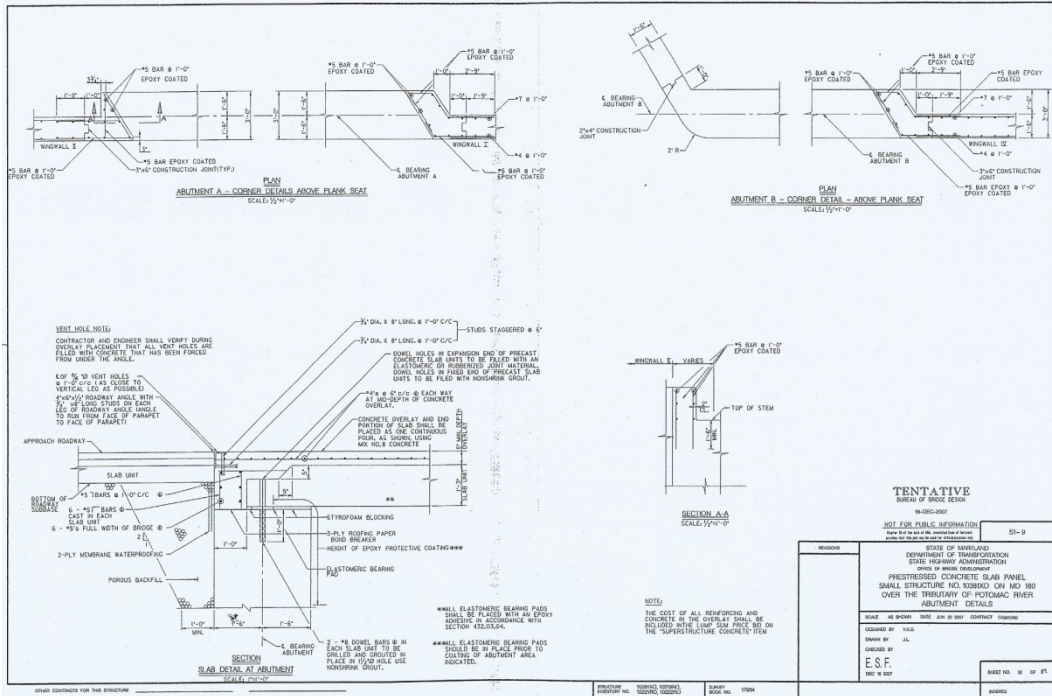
Abutment and Corner Details of the Knoxville, MD, Bridge
